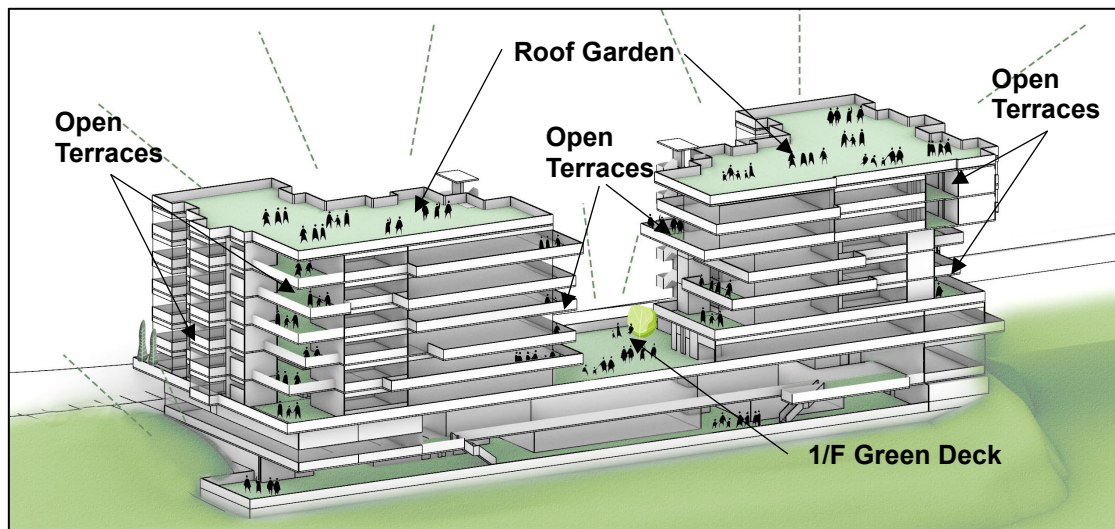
Proposed Terraced Design at 1/F to 6/F
